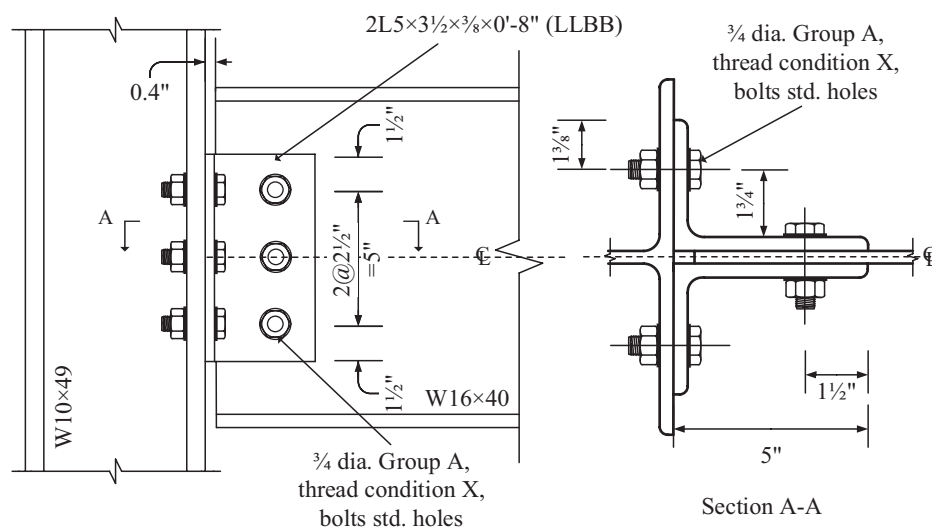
Detailed design for W16x40 beam connected to W10x49 column through a double-angle connection.
